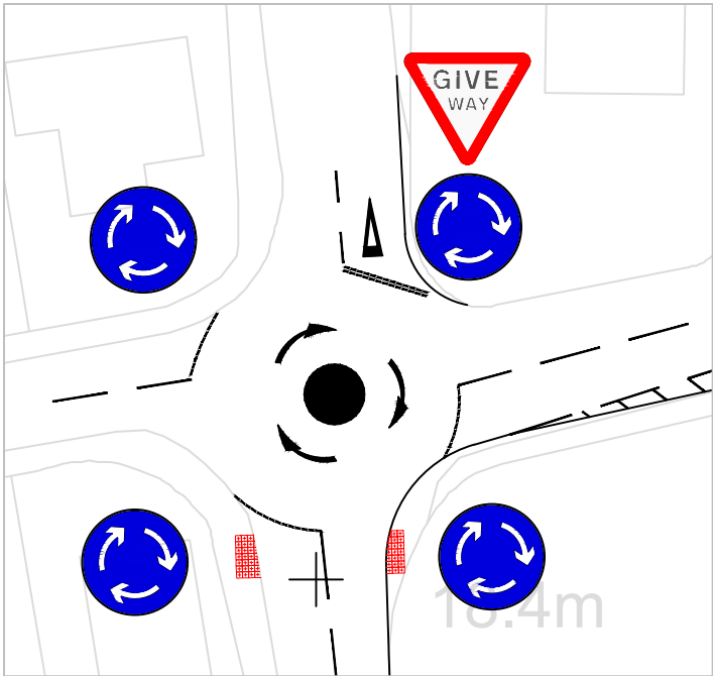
Mini Roundabout junction with New Road (E) / Torr Road (N and S) / The Borough (W)
